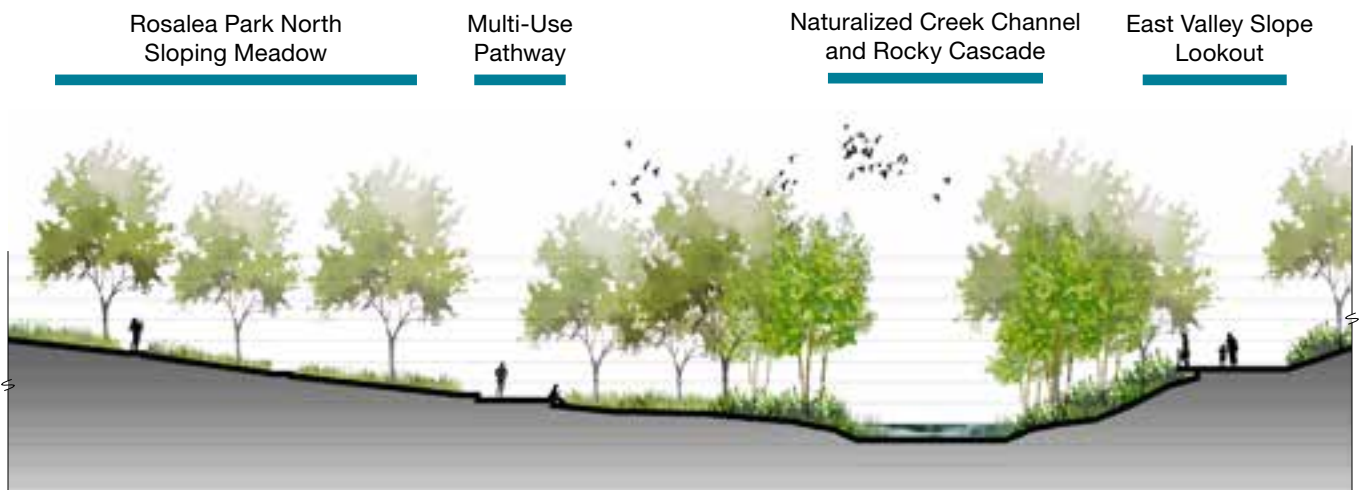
Section Through Stepping Meadow at Rosalea Park North
